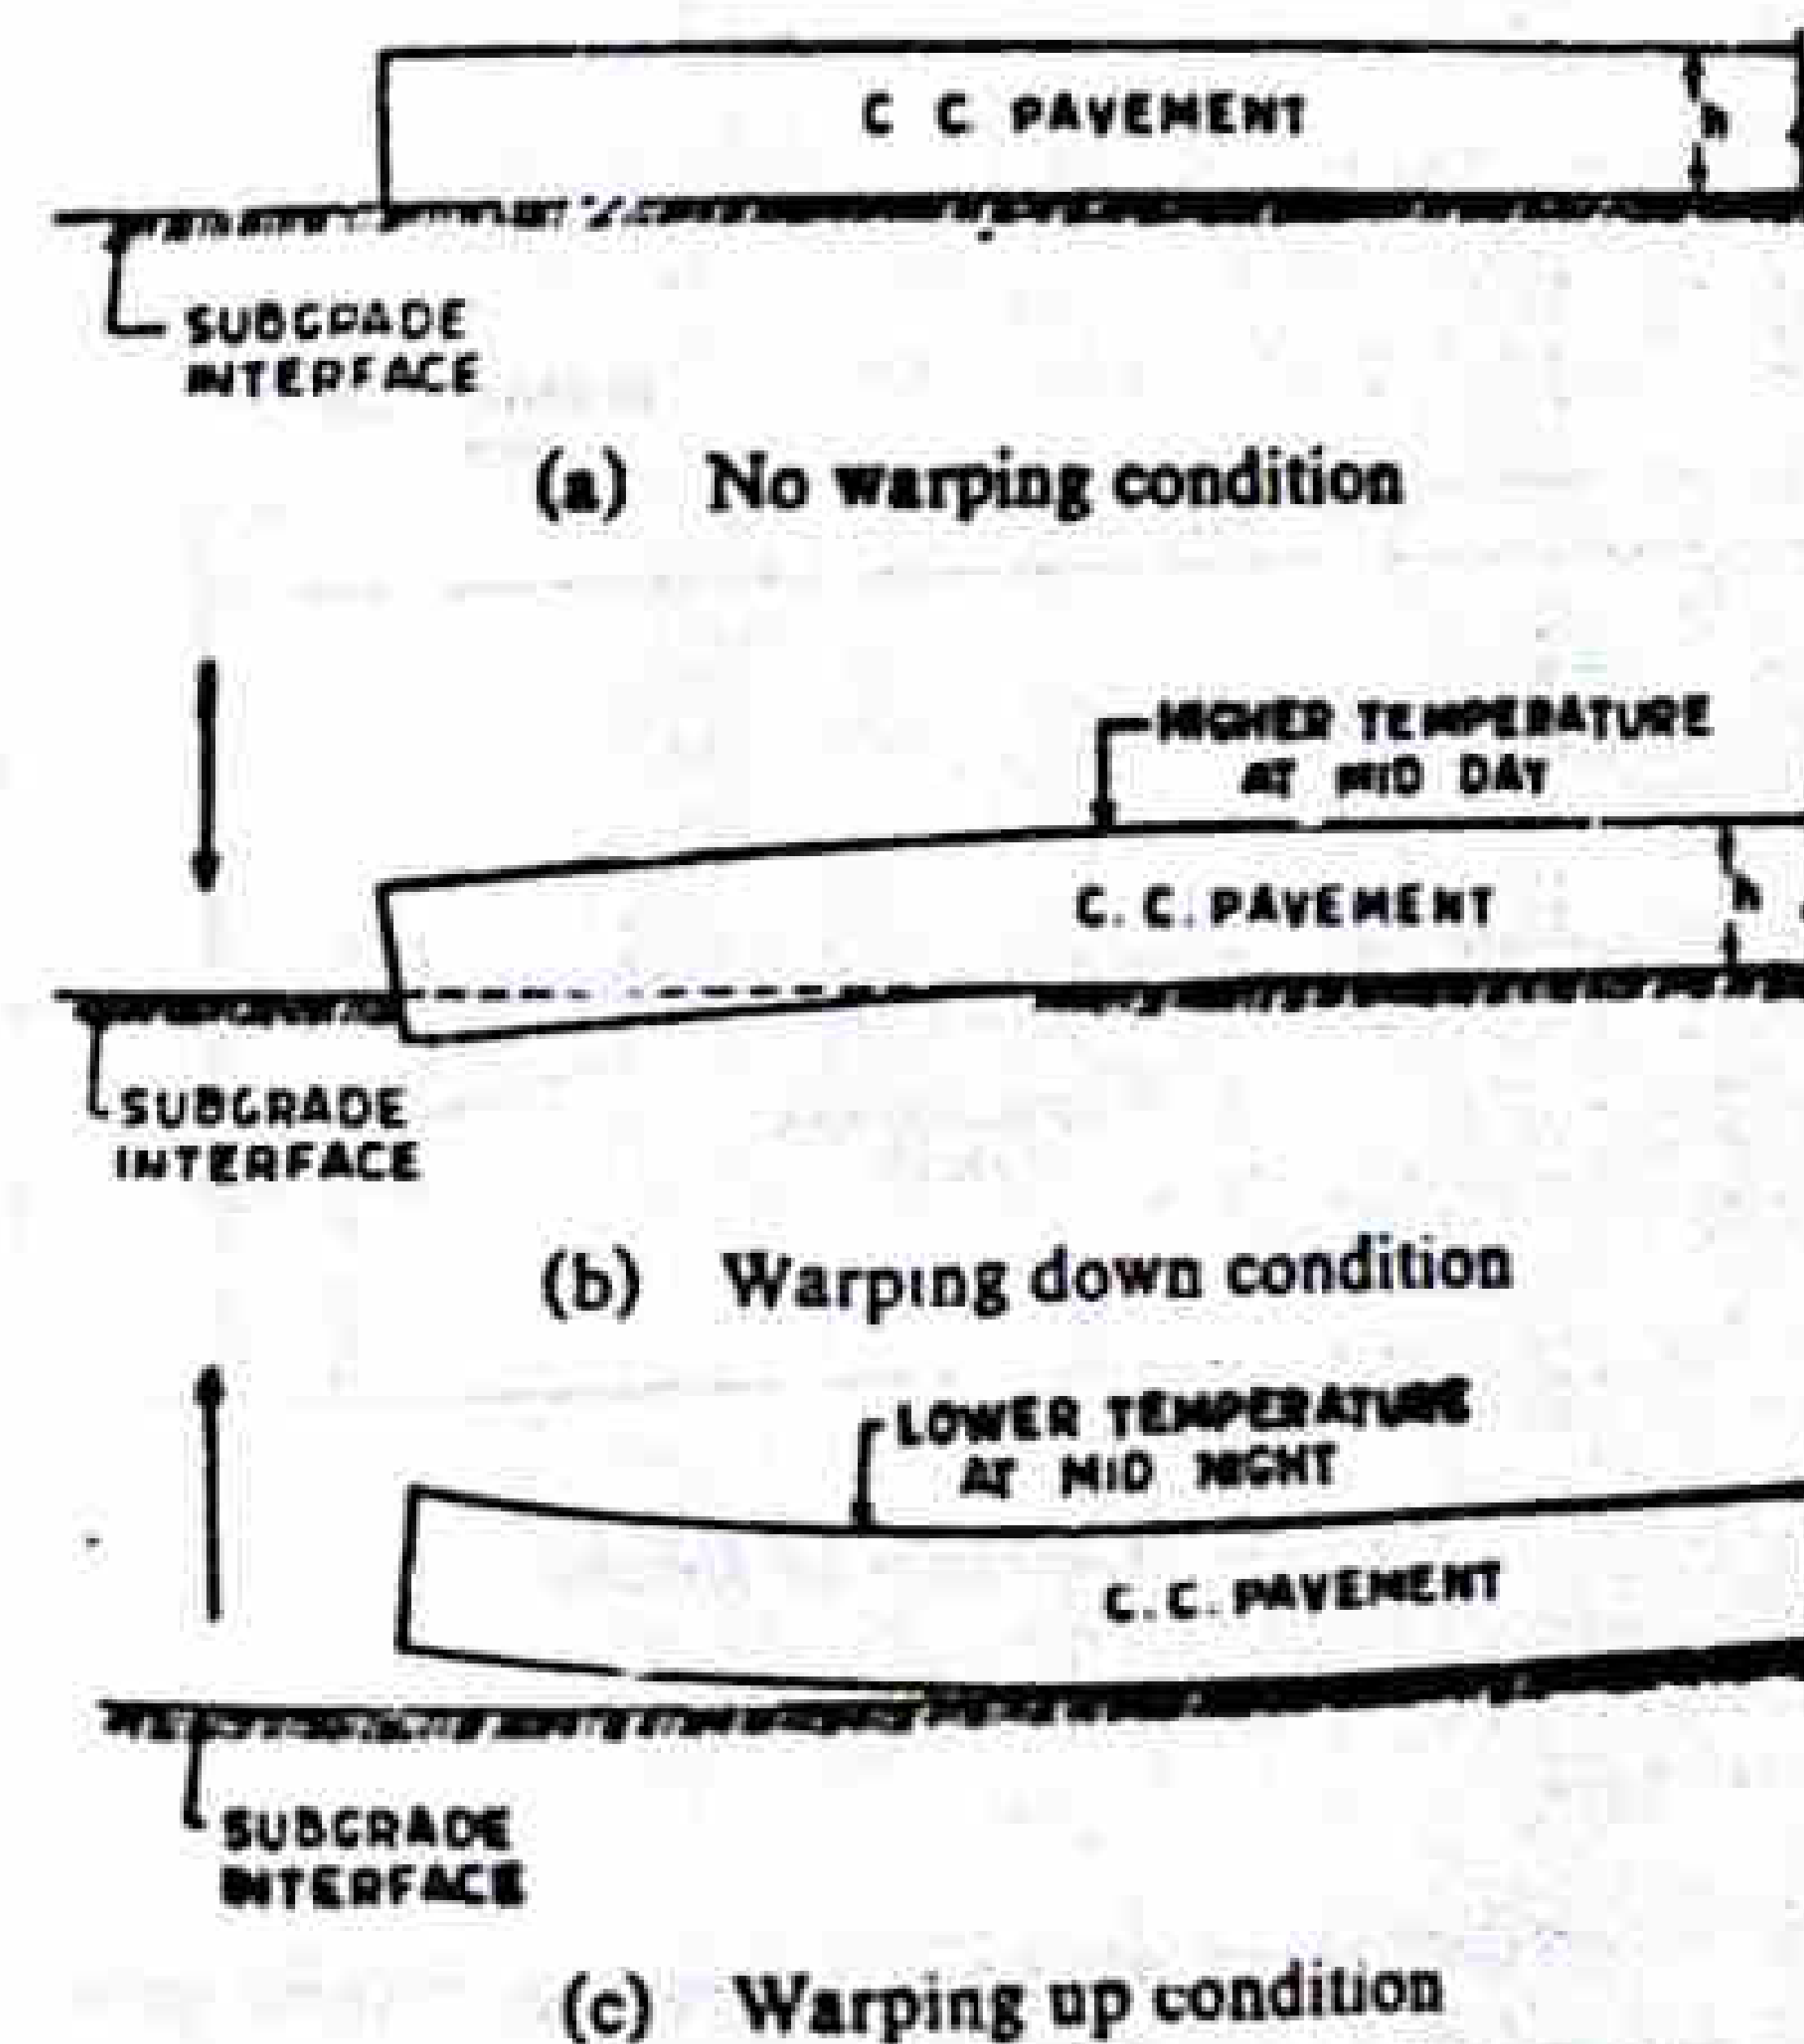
Warping of Cement Concrete Pavement Slab
